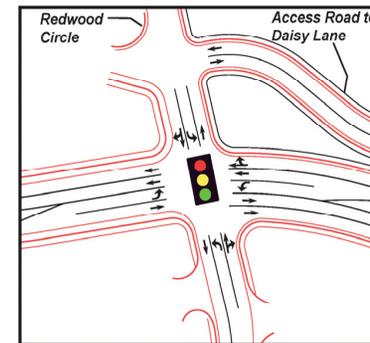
ALTERNATIVE C BETWEEN DOWELL ROAD AND FAIRGROUNDS ROAD
